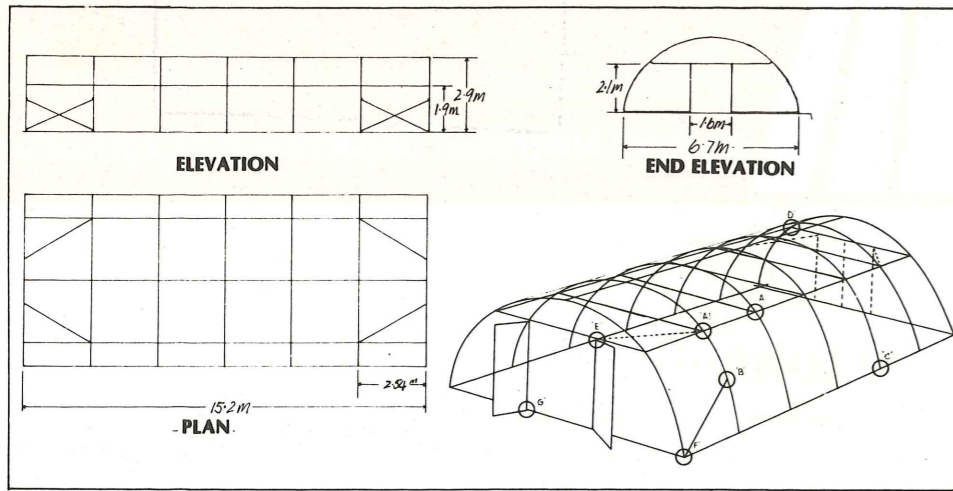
Elevation, plan and three dimensional view of single layer plastic tunnelhouse (detail of pipe joints is shown in separate drawings)
